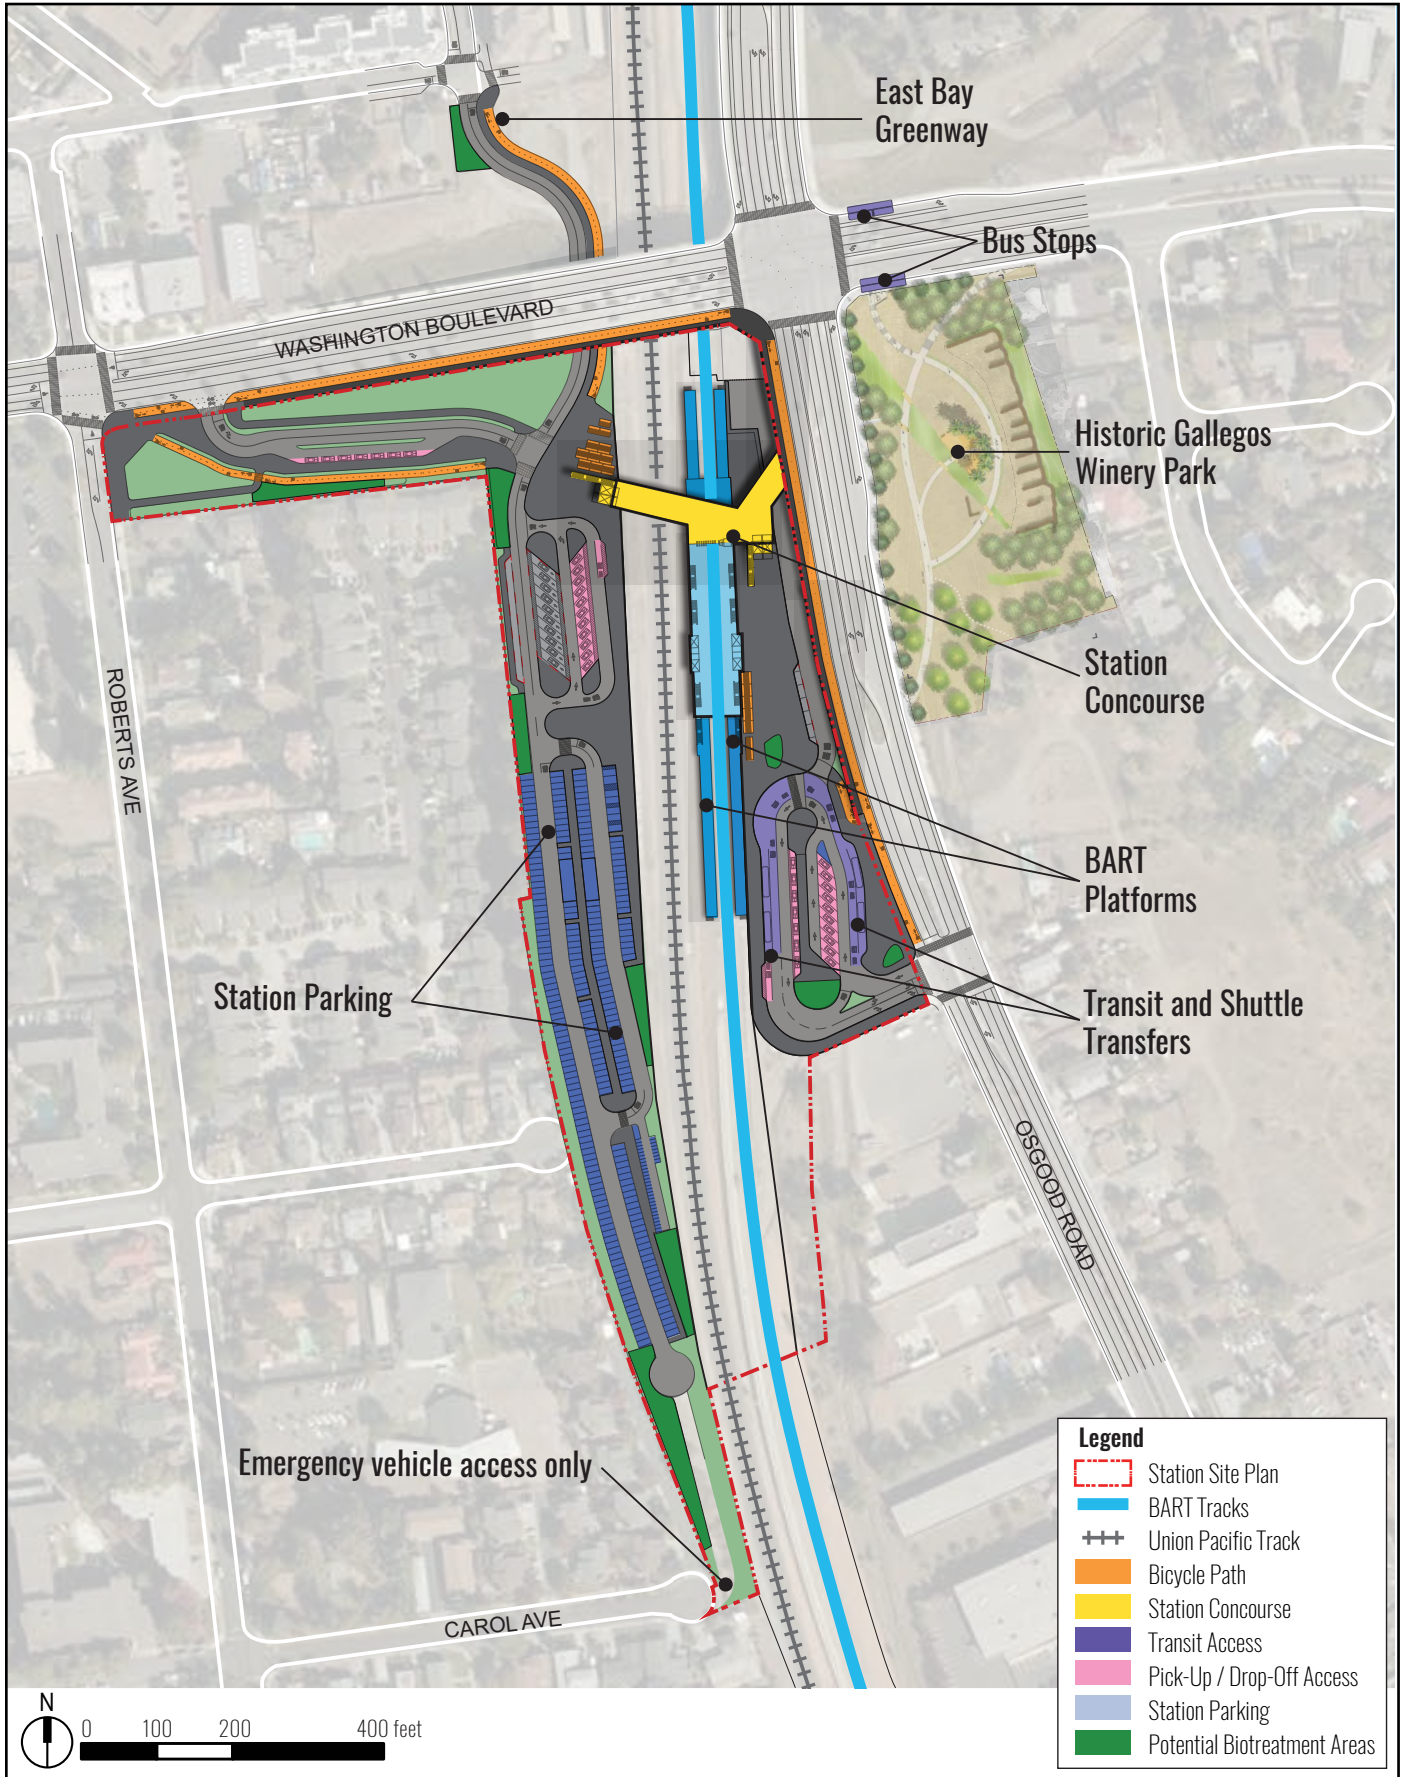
Station Site Plan and Gallegos Winery Park
